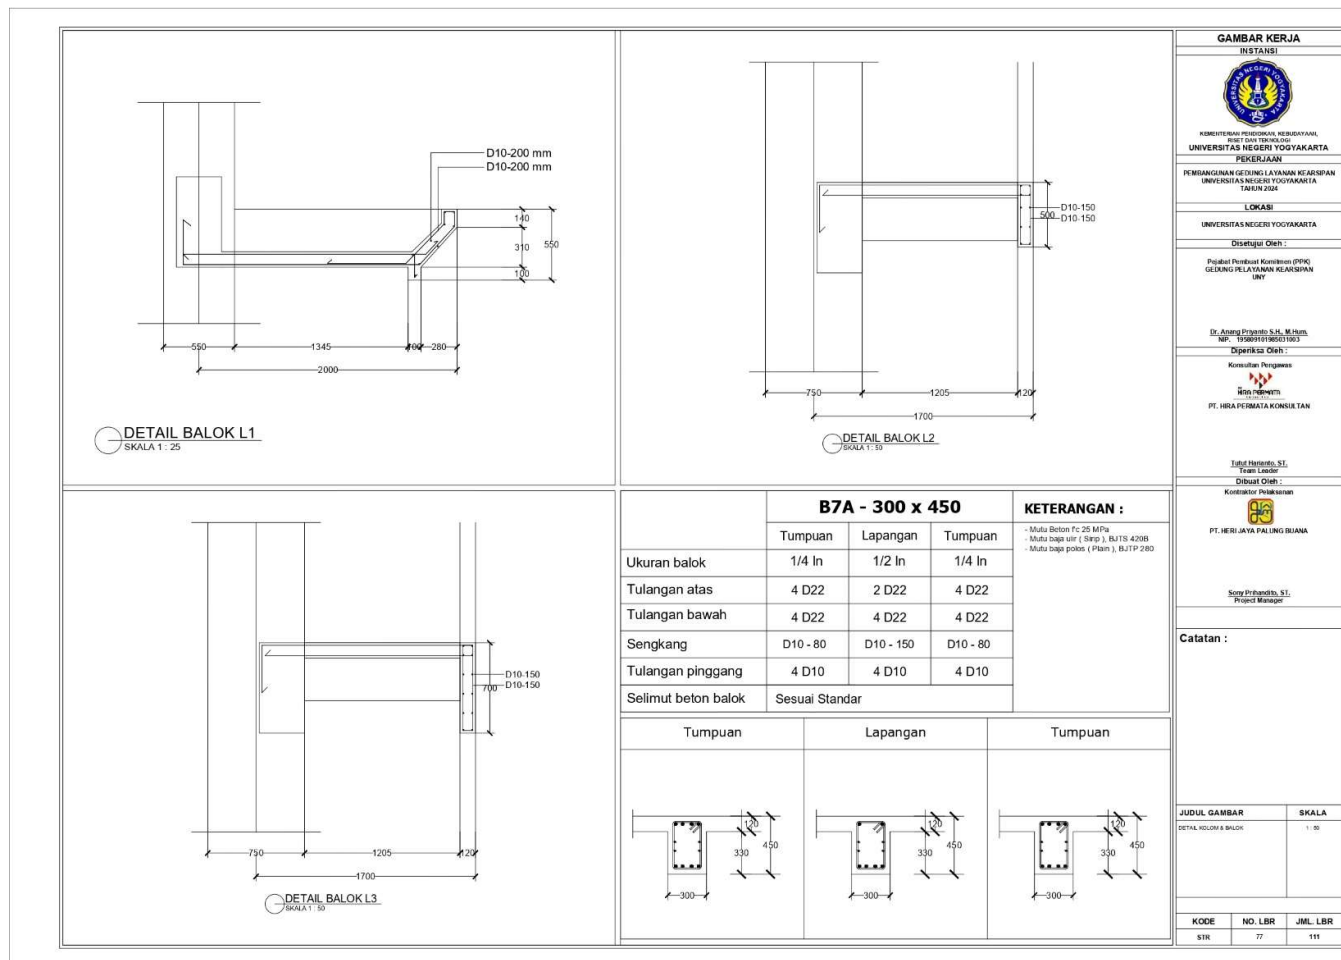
29 Detail of Beam B7A, L1, L2, and L3
